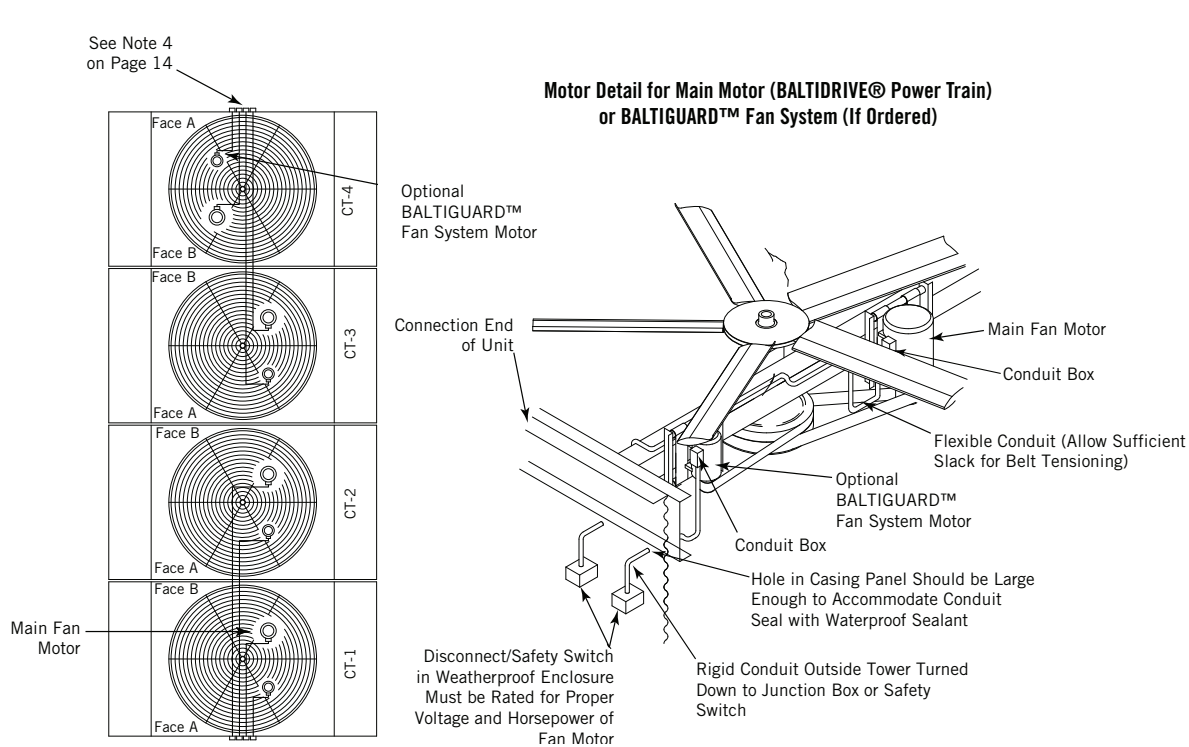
Belt Drive Motor Location(s) for Models that Ship in One Section
